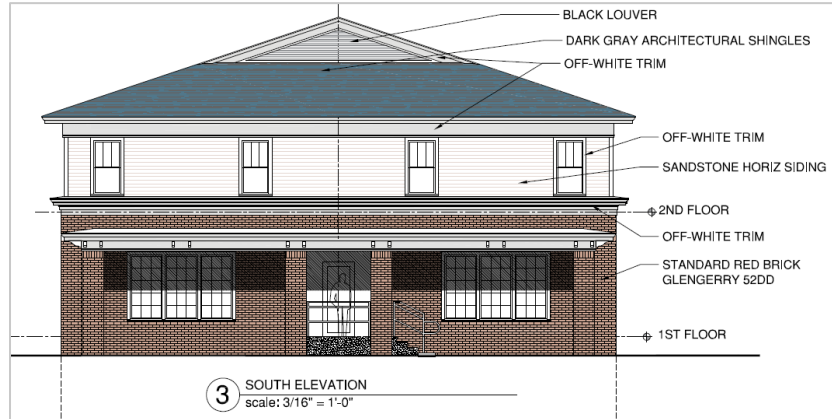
The proposed southern building façade for the new mixed-use building, which will be visible from Gilbo Avenue.
